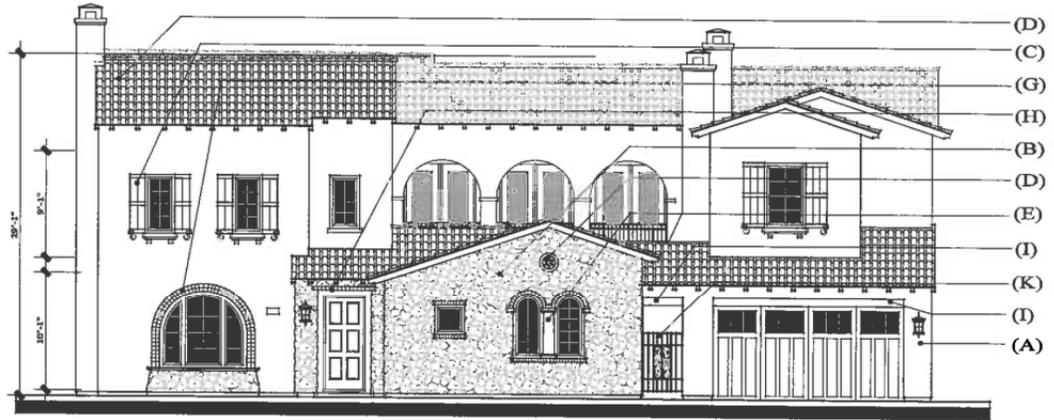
Plan 6 – Traditional Style, Other Elevations
